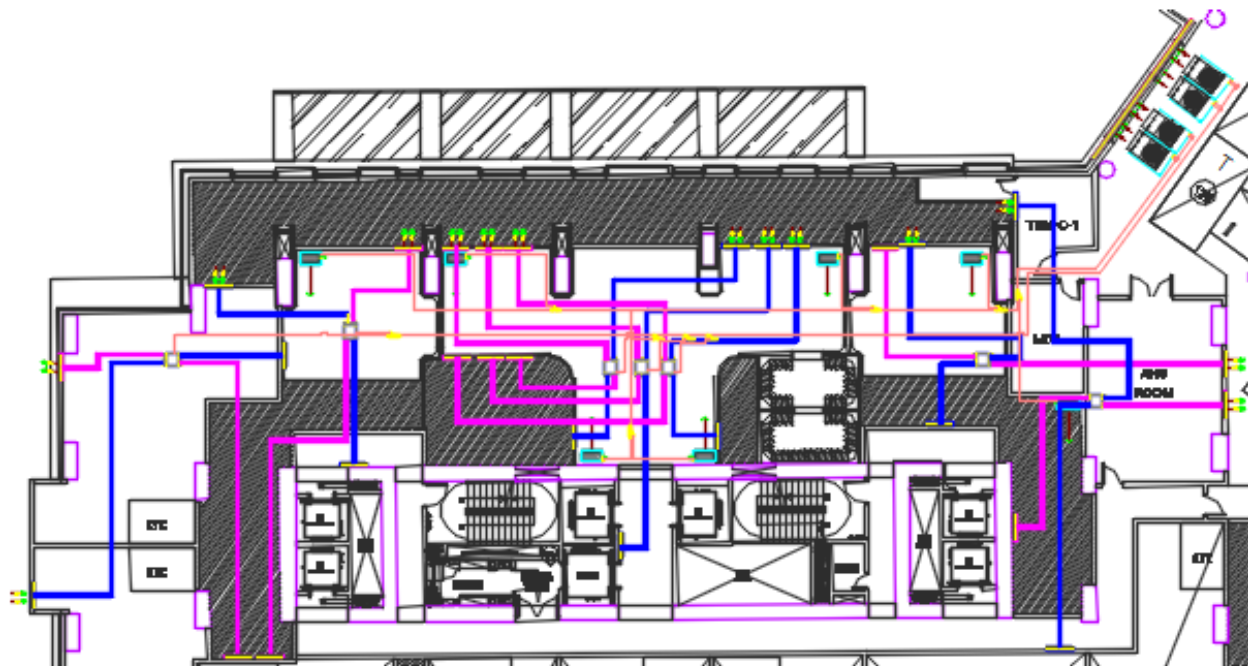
Layout for Option 3 at Mezzanine of Ground Floor
